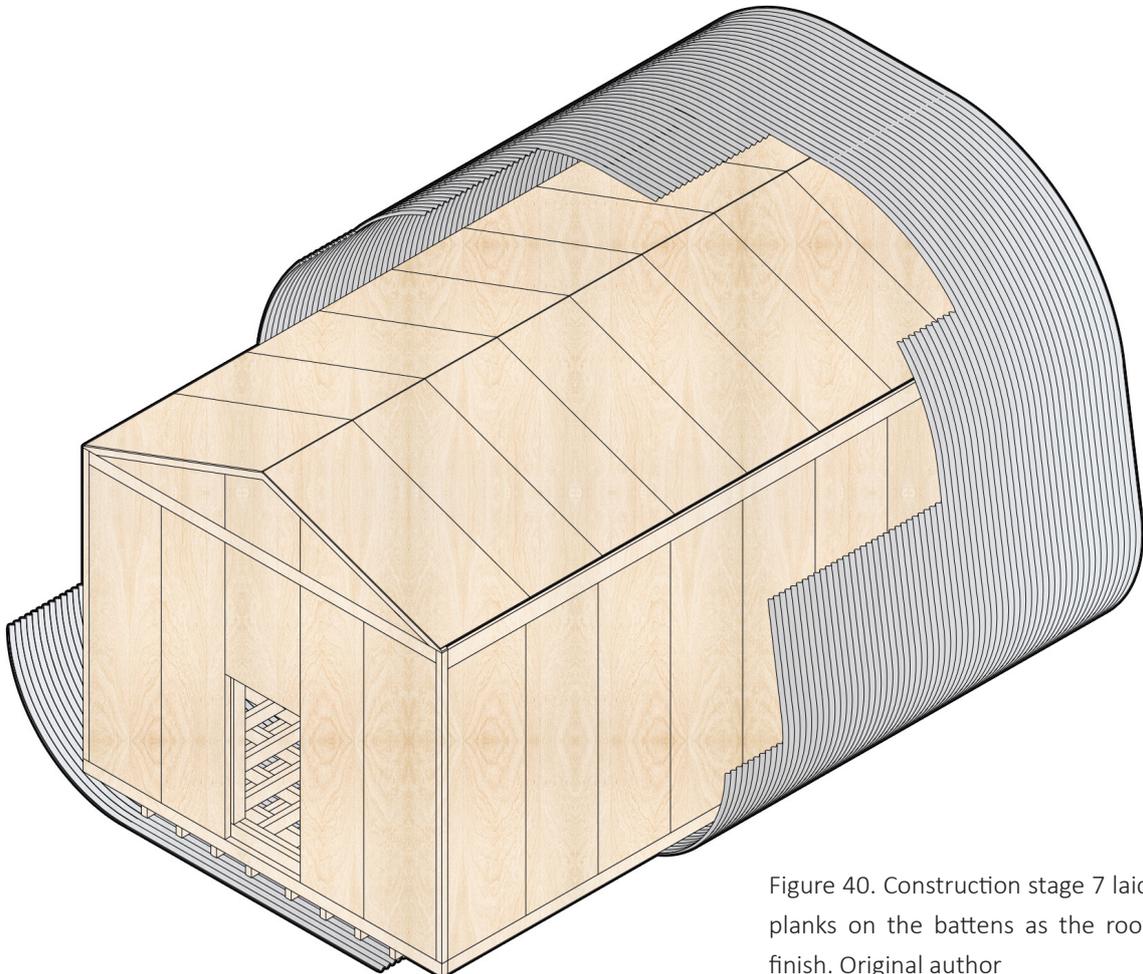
Construction stage 7 laid planks on the battens as the roof finish. Original author
